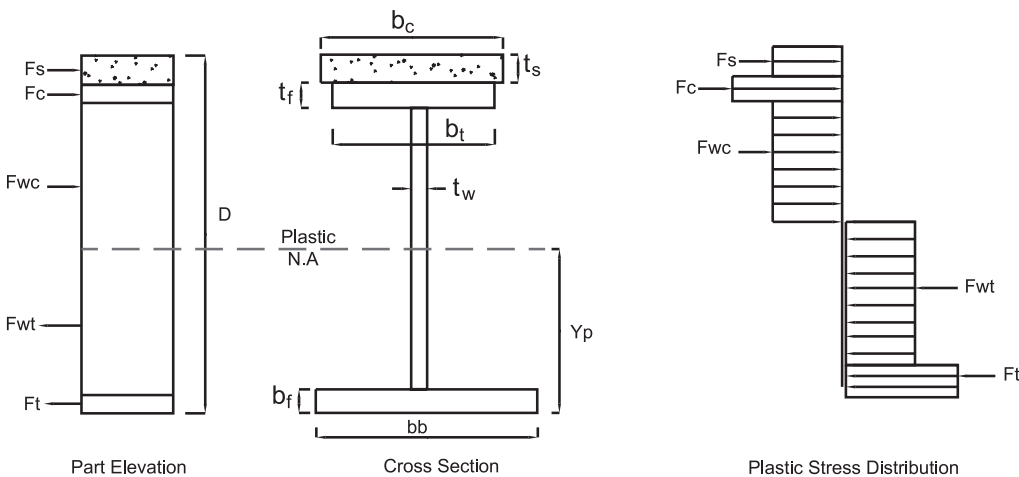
Plastic forces acting on composite section when plastic N.A. is located in web.
